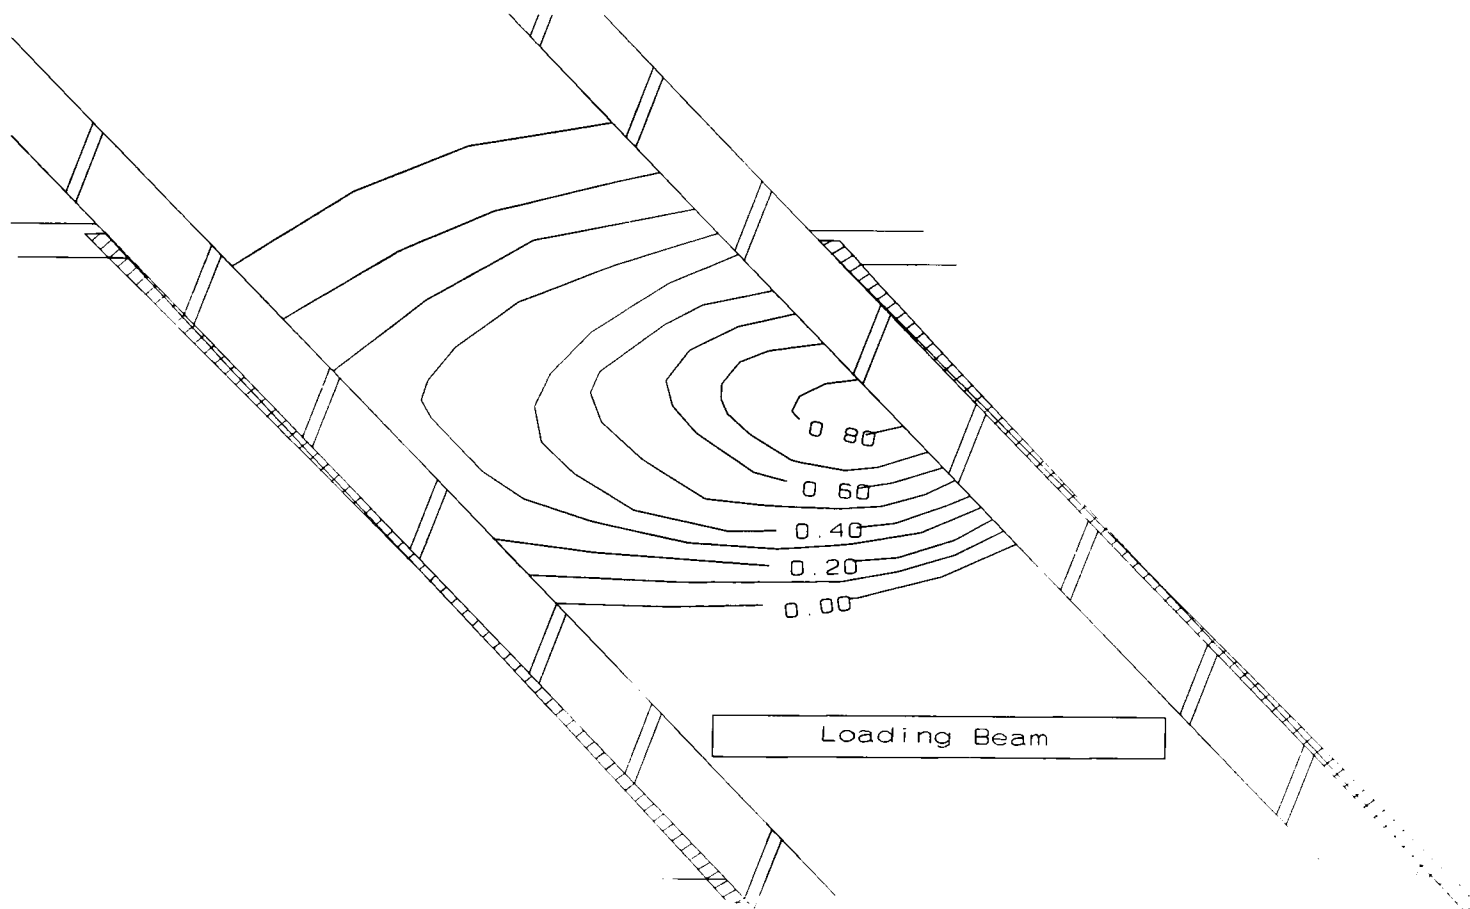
Heave of Surfacing of Bridge 3-3 at failure
